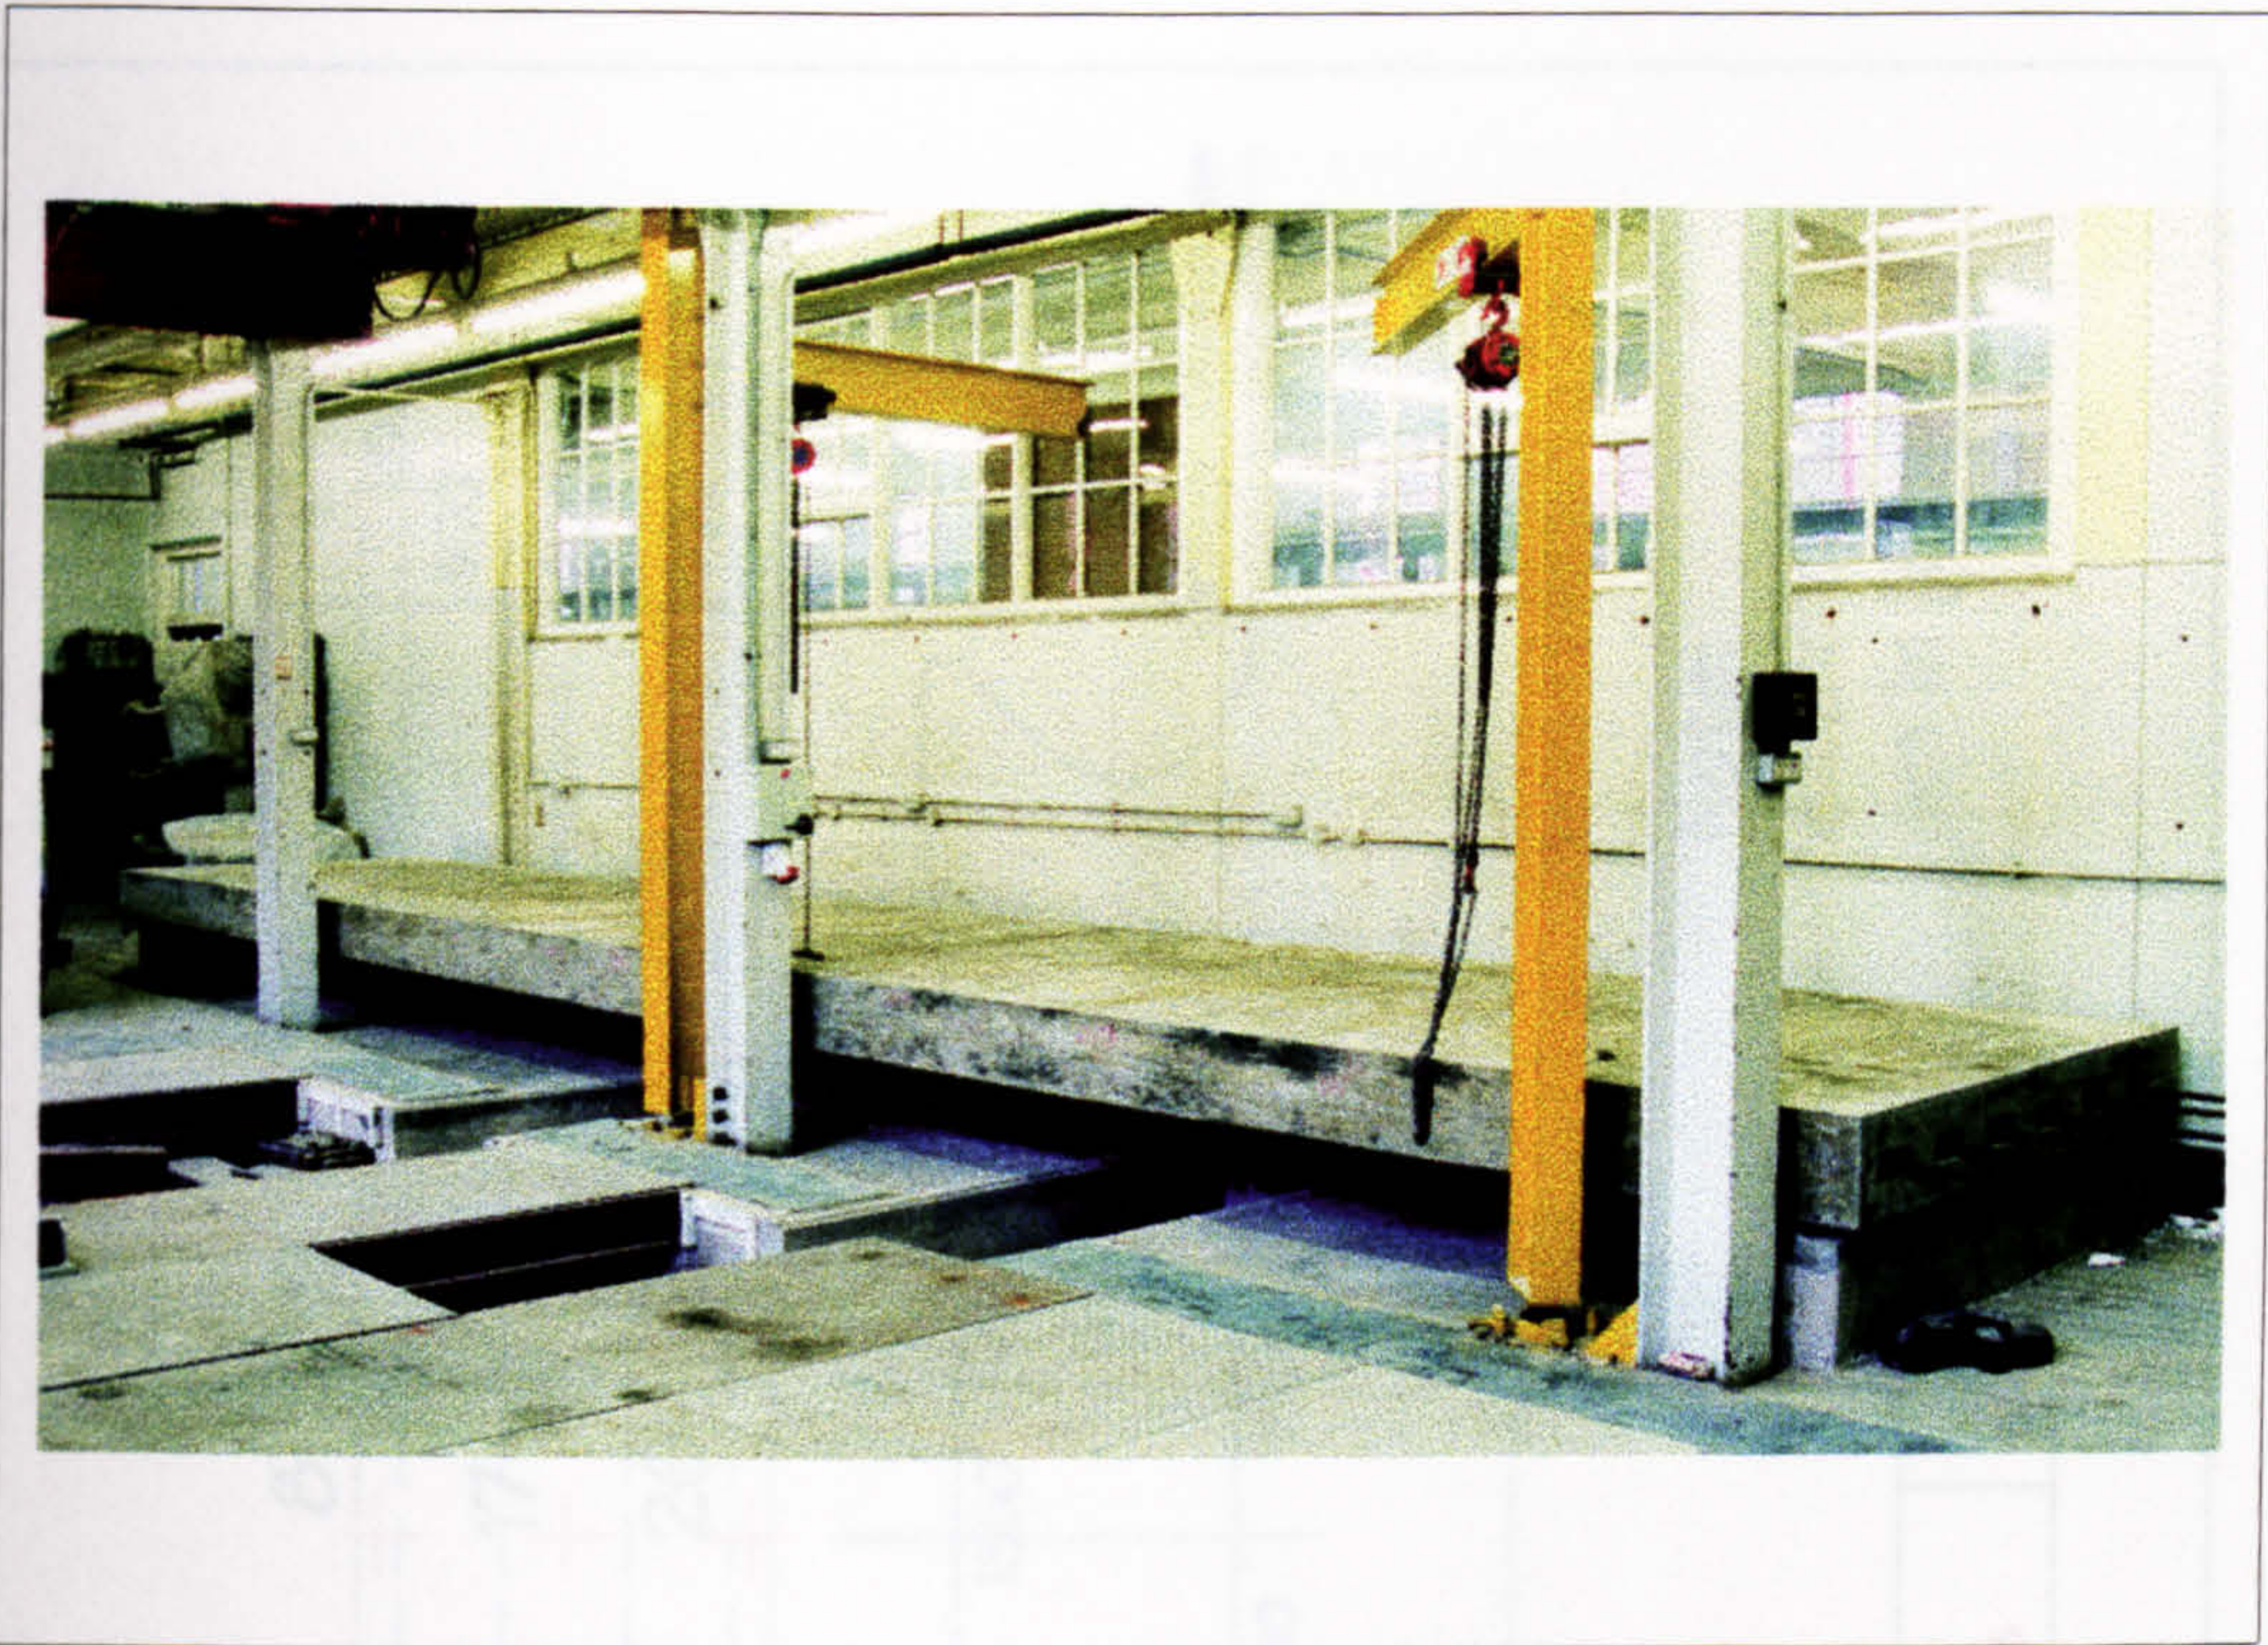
Structure A - PT slab strip erected within the Strong Floor laboratory, Department of Civil & Structural Engineering, University of Sheffield.
